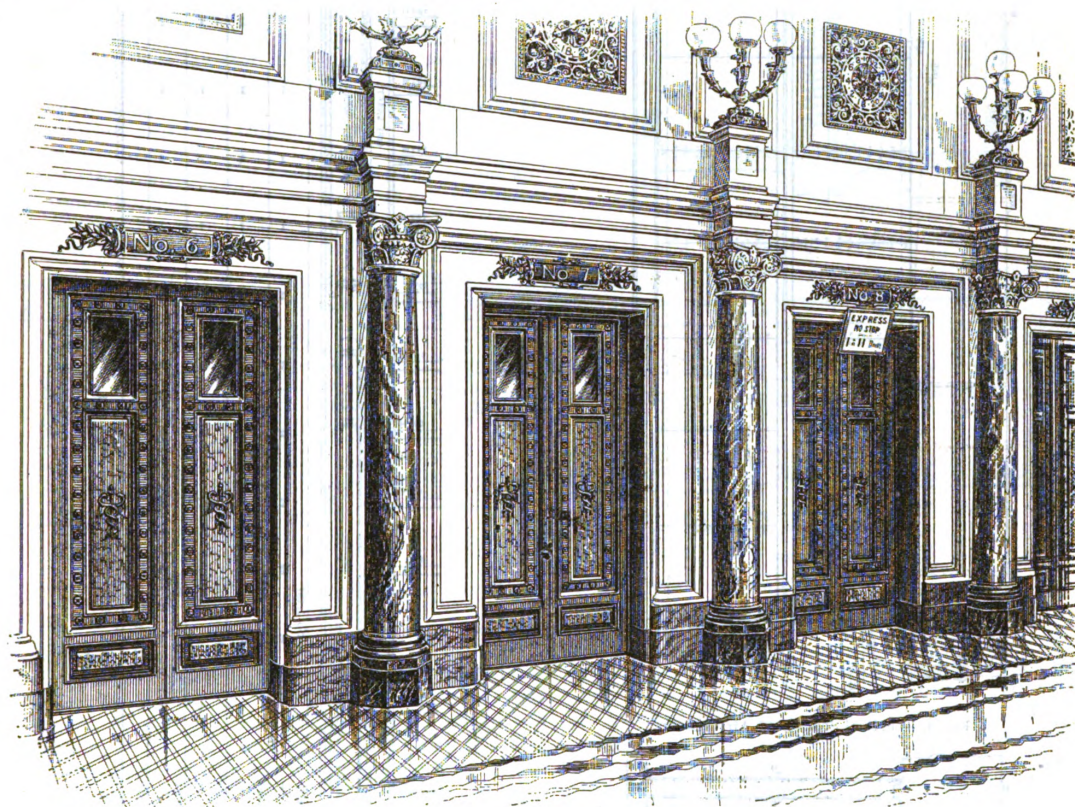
View of Elevator Openings on Main Floor of Empire Building.
